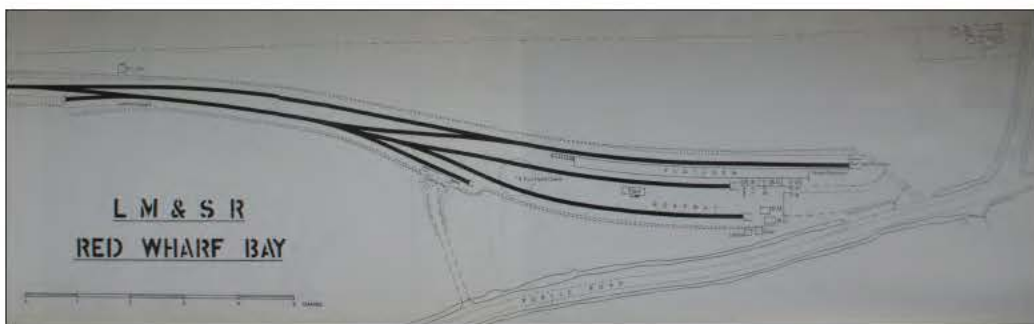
L.N.W.R Red Wharf Bay Station Plan.
